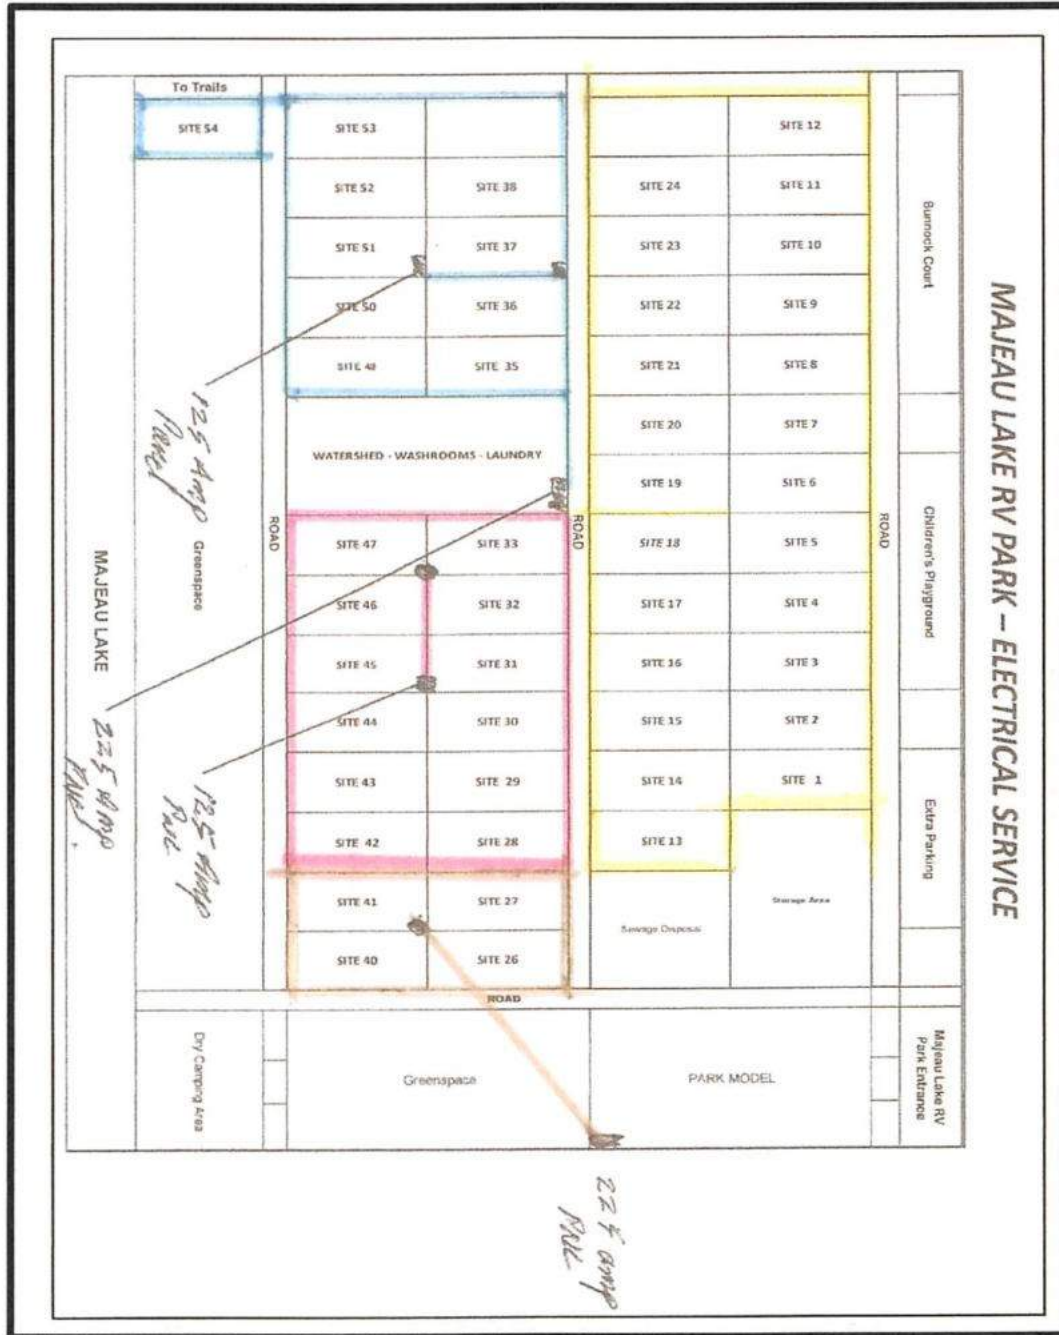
Location of Majeau Lake RV Park Electrical Servicing
